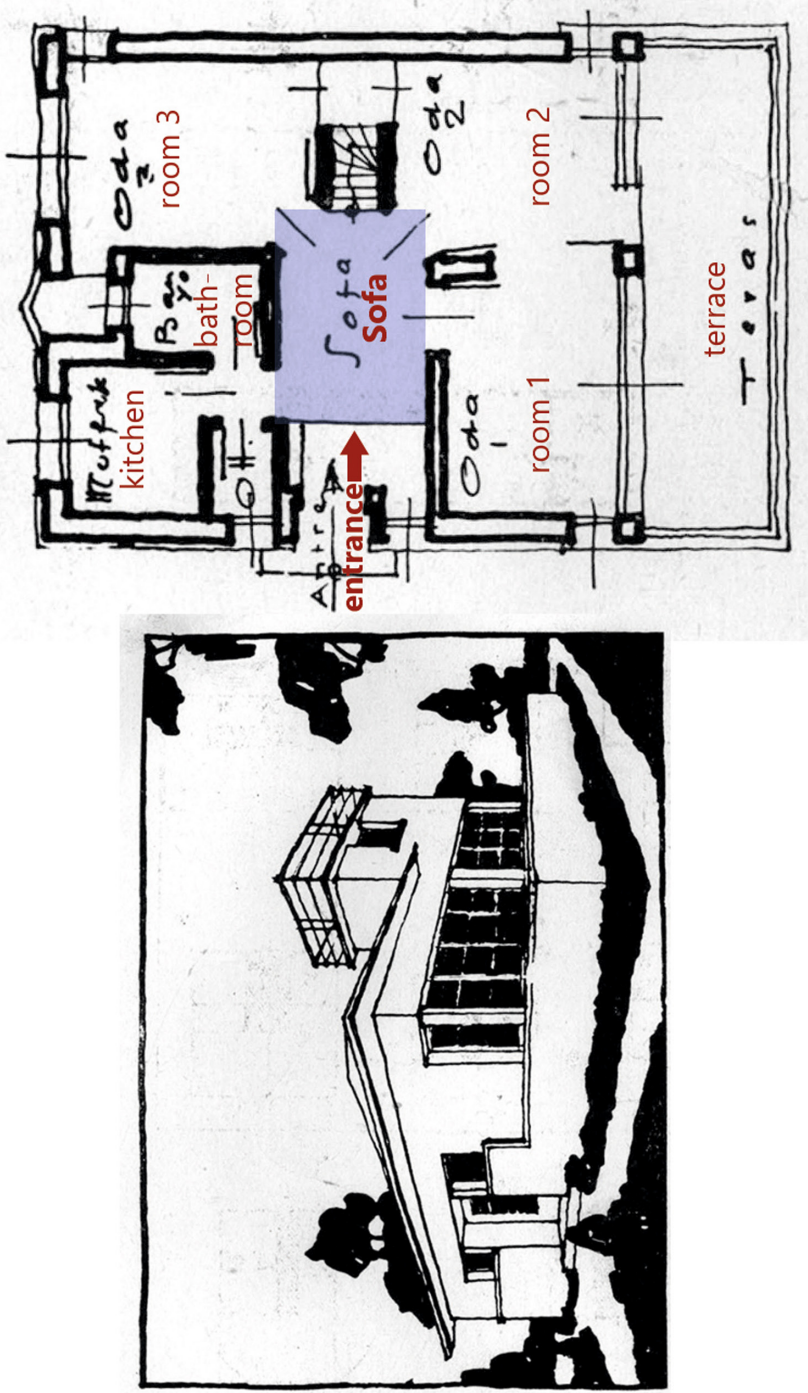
Architectural drawing of a single-story house design by Abidin Mortaş, featuring a central sofa as a key element of the layout. (Source: Mortaş, 1931).
